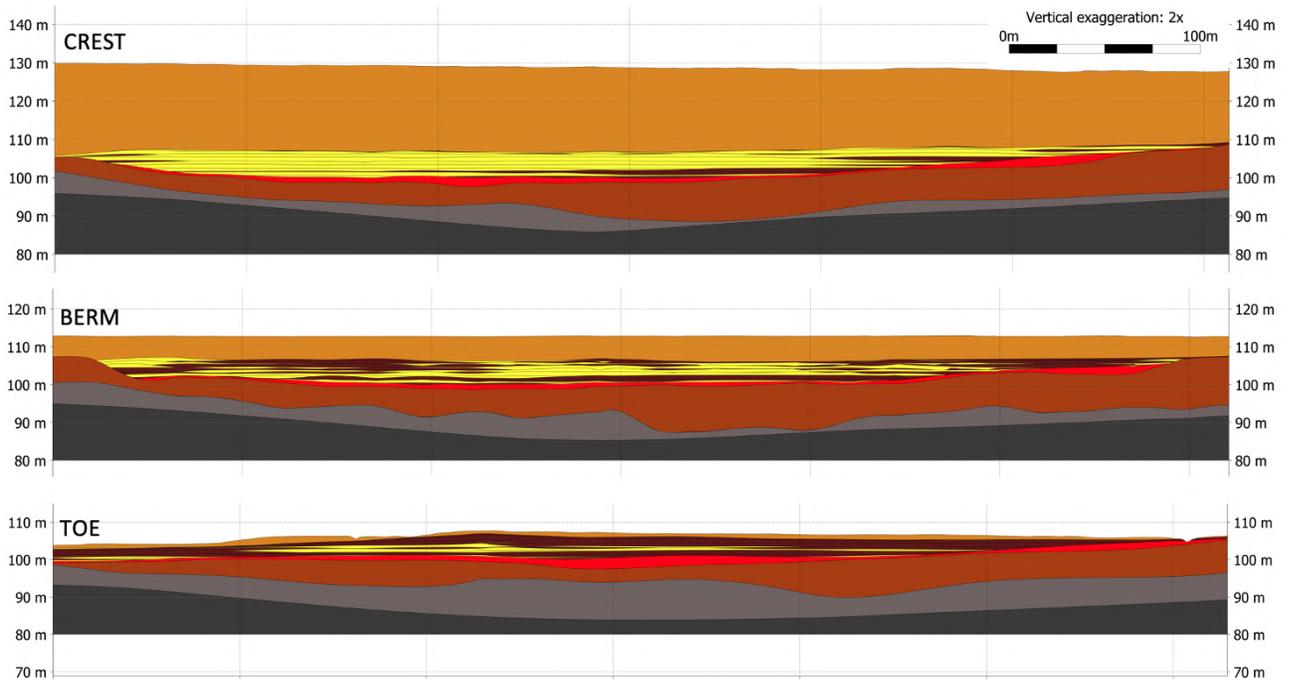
Example of a longitudinal cross-section along the dam crest, berm and toe
